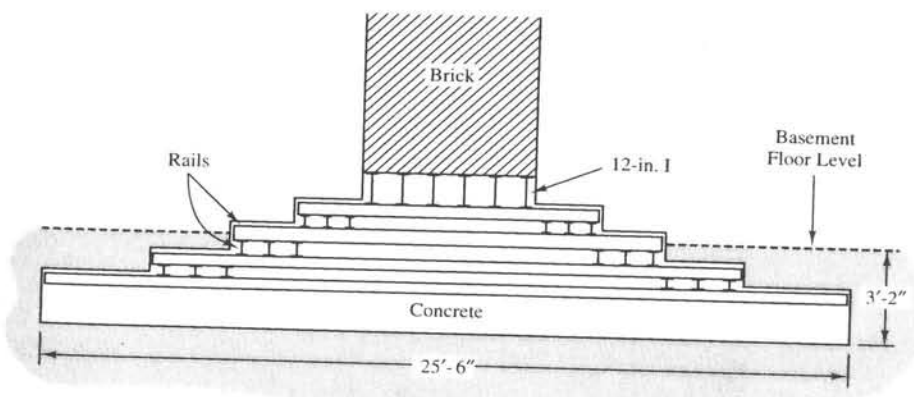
Steel grillage footing made from railroad tracks, Montauk Block Building, Chicago, 1882. The concrete that surrounded the steel was for corrosion protection only (Peck, 1948).
